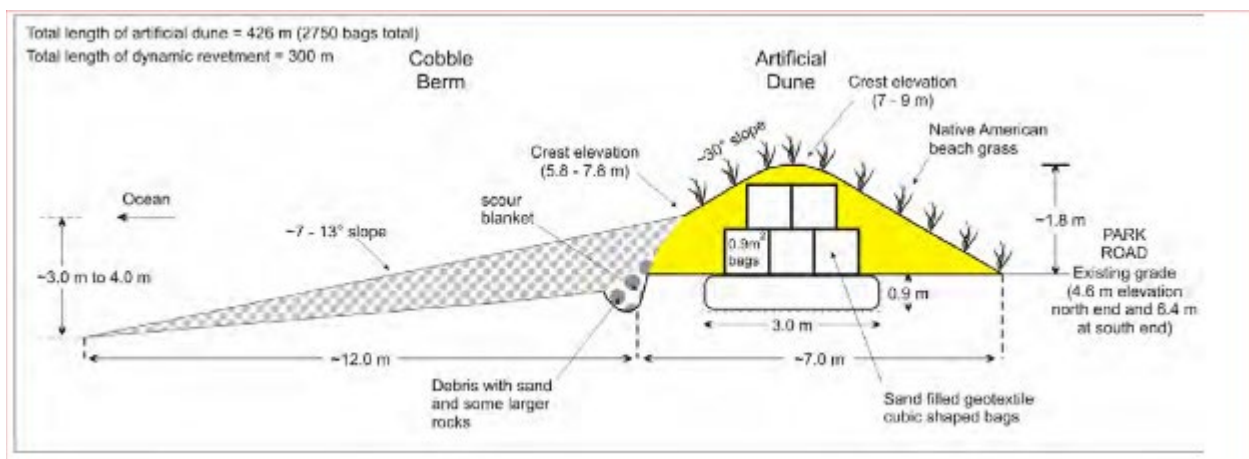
Dynamic revetment and artificial dune at Cape Lookout State Park, Oregon.
